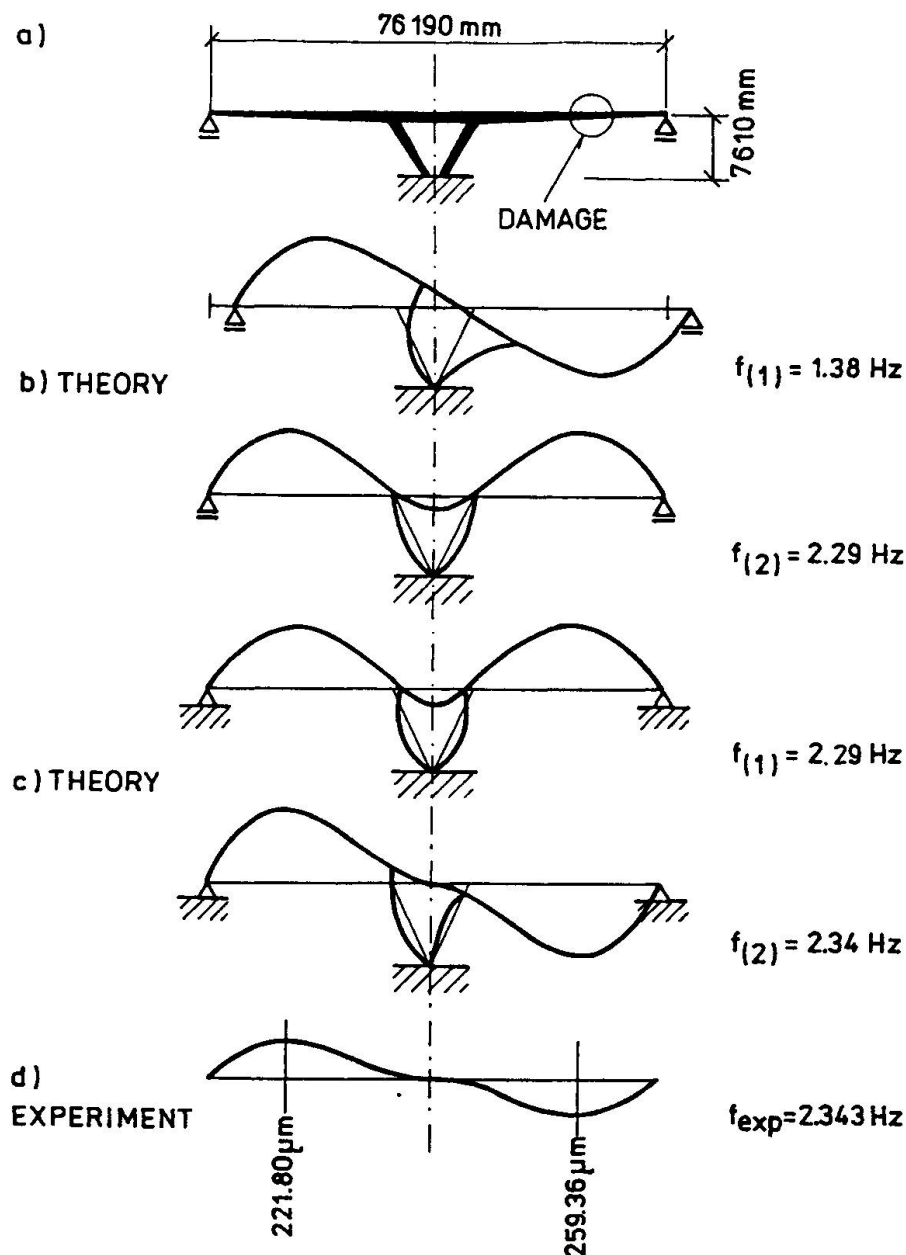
Prestressed concrete highway bridge of length 76,19 m
